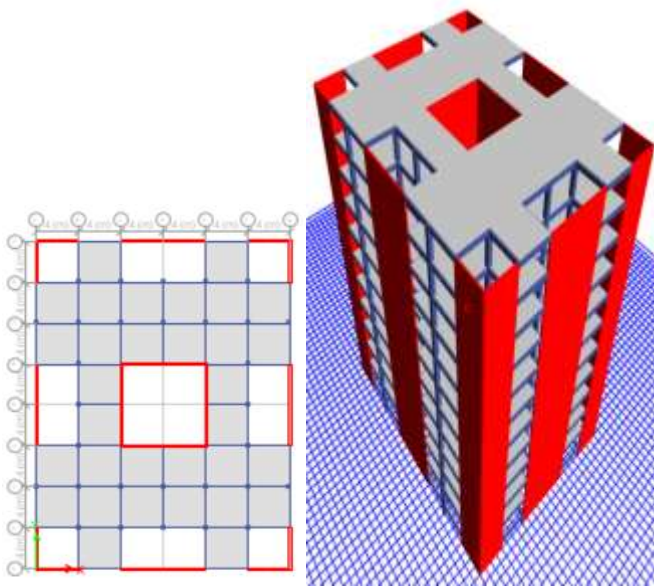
Plan elevation & 3D view for 33.32% opening with shear wall at center & periphery of the openings.
